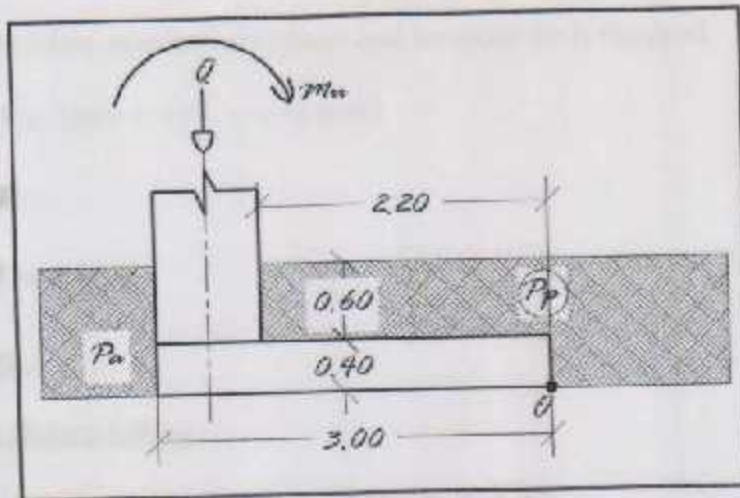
Forces for check against sliding failure - Exterior frame footing
